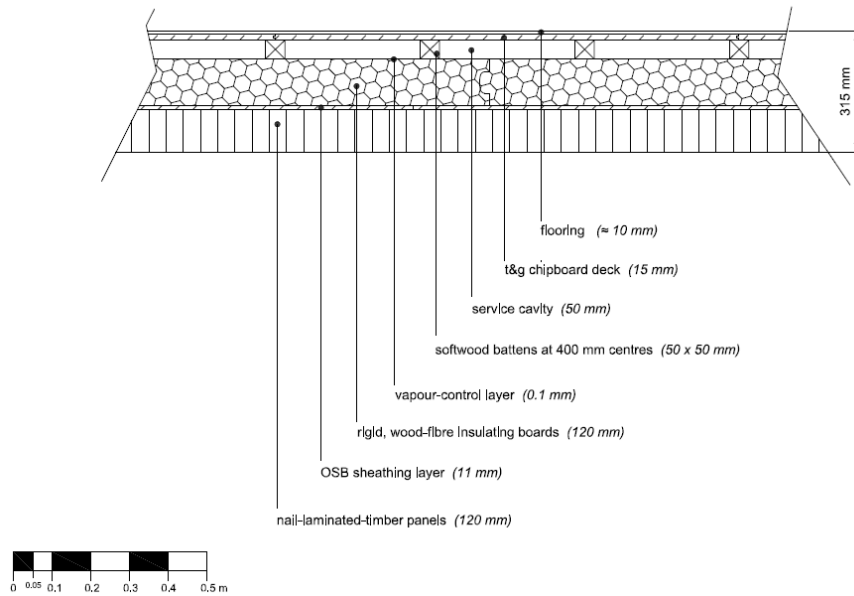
Ground floor E (suspended, nail-laminated timber (NLT) floor), cross-section.
